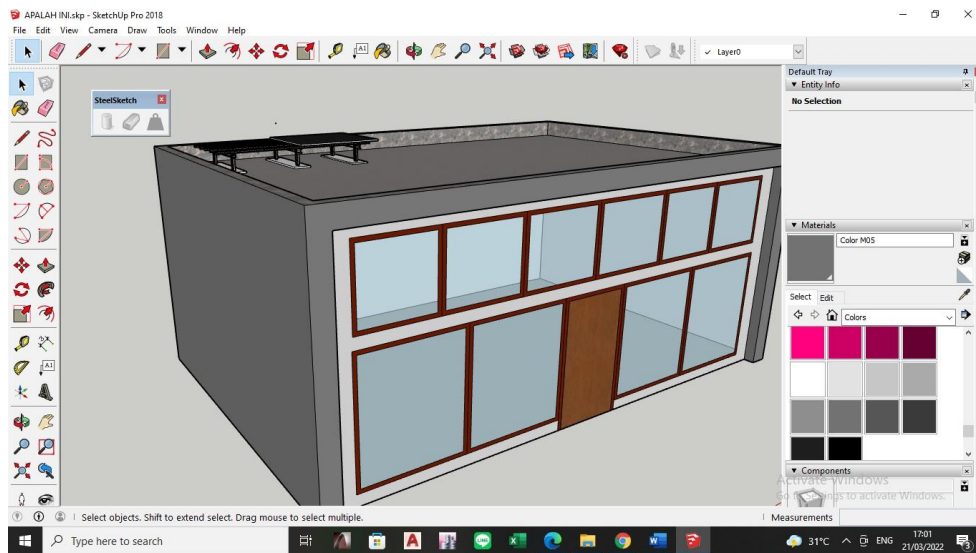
RAM Structure Application Placed on Top of Building Structure Looks as a Whole
